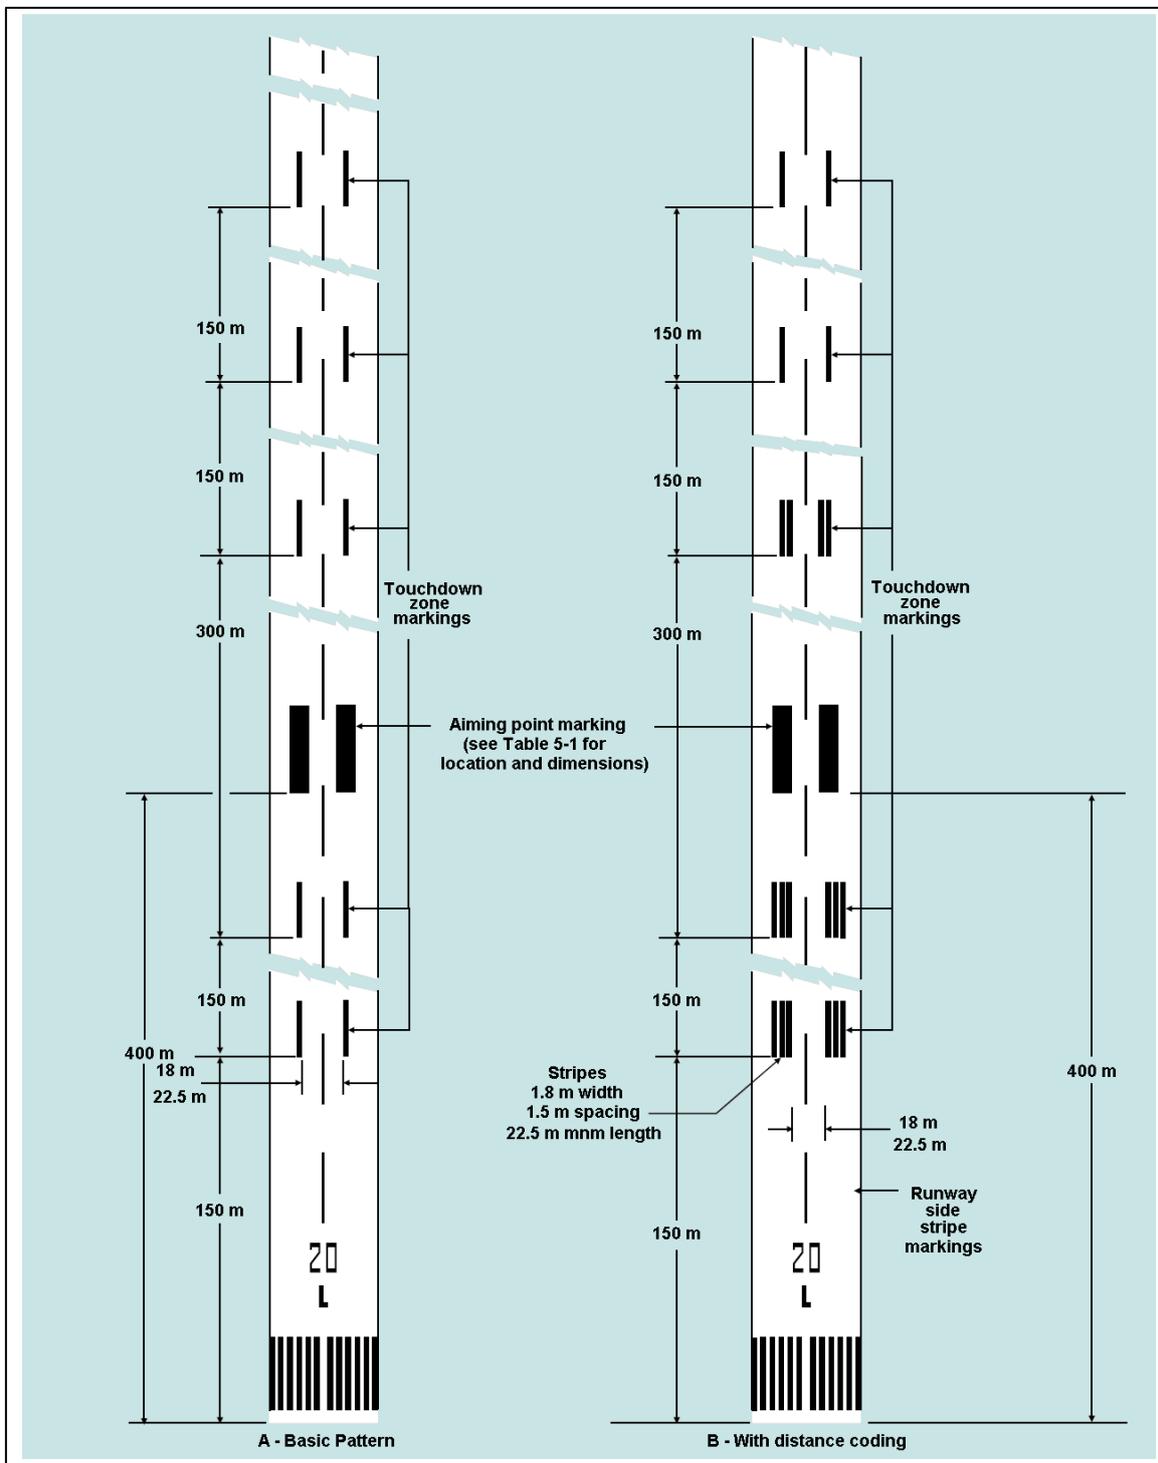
Aiming point and touchdown zone markings (illustrated for a runway with a length of 2 400 m or more)
